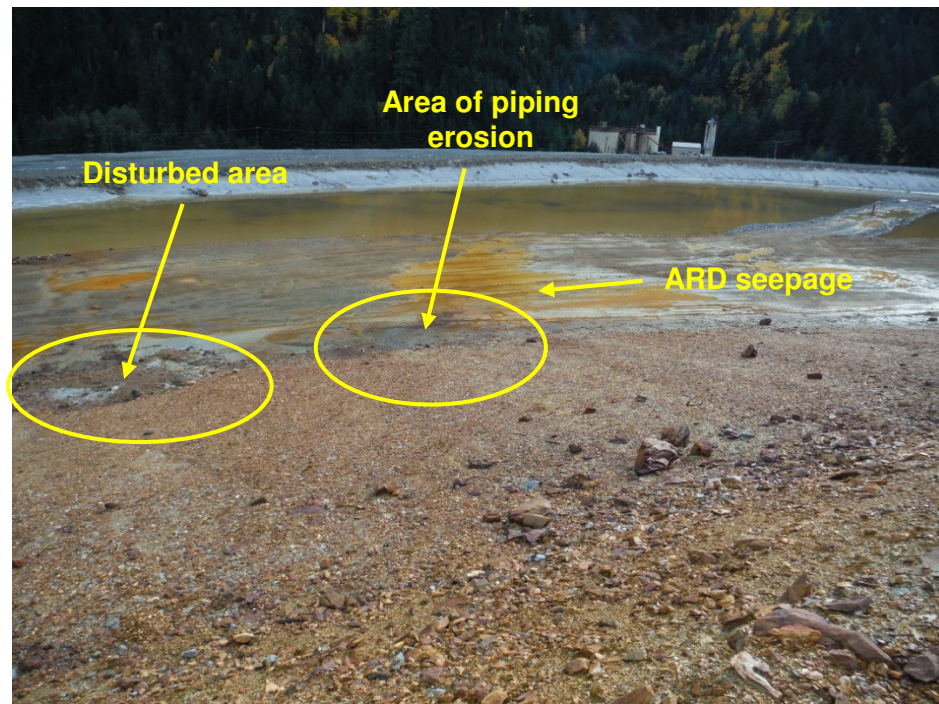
Disturbed wet ground, ARD seepage and a discrete seepage source with signs of piping erosion at the corner of the Paste Berm near Instrument Plane C (October 23, 2014).
